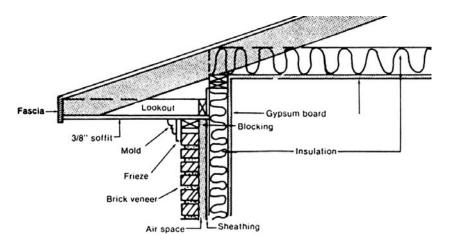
Cornice detail. (From Jackson, 1987.)
